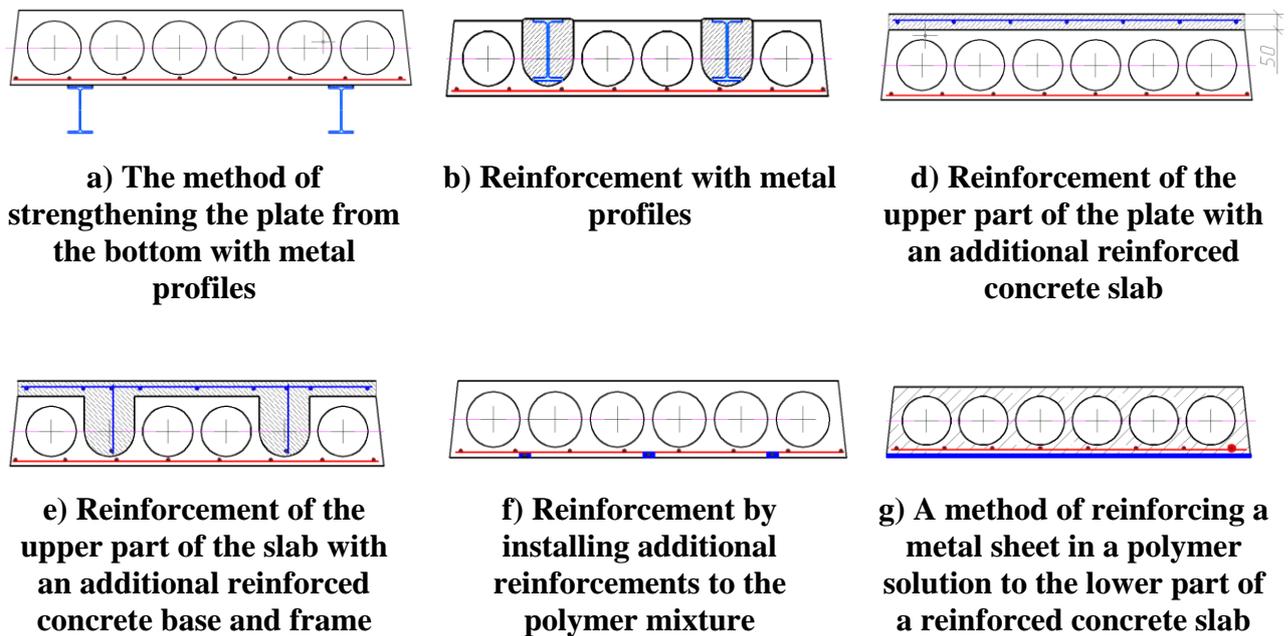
Methods of strengthening multi-cavity reinforced concrete slab.
